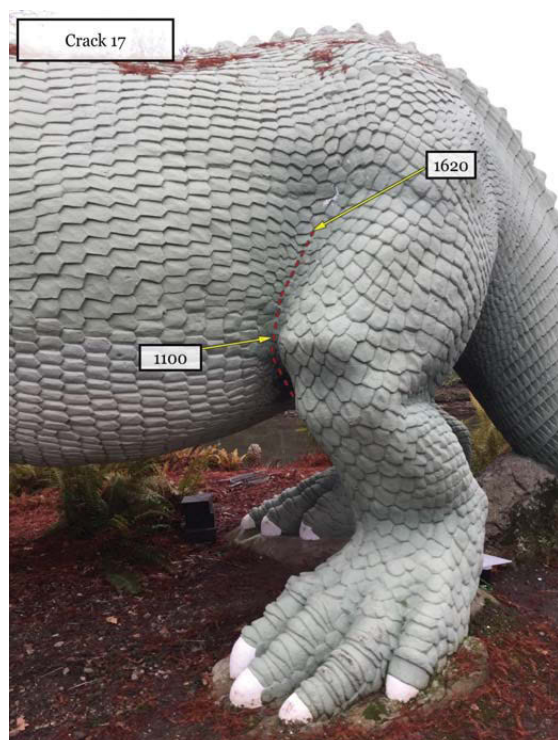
Crack 17a – Photographed 15.12.16<sup>84</sup>
